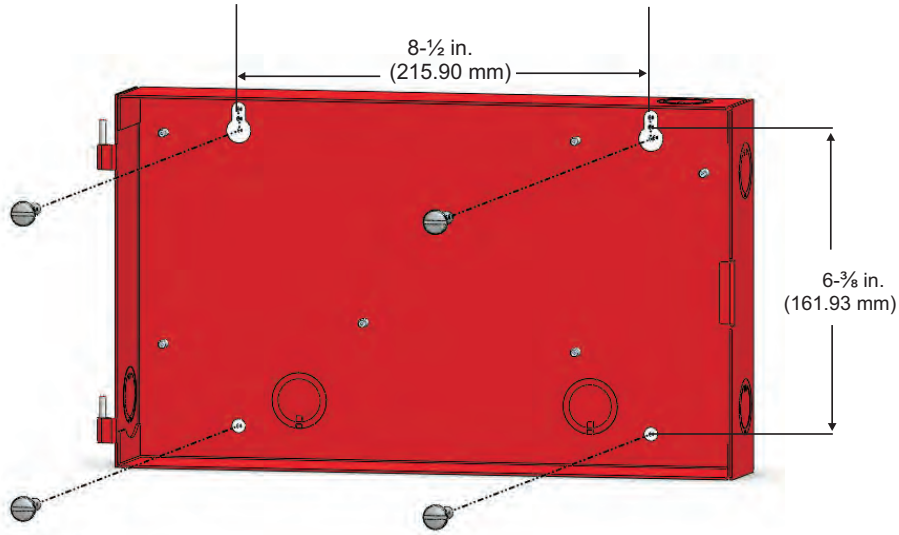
Surface Mounting of the Remote Enclosure (shown without RDCM or R-LAM modules)
